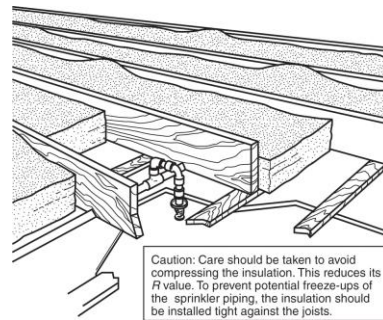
(e) Insulation Recommendations – Arrangement 5.
